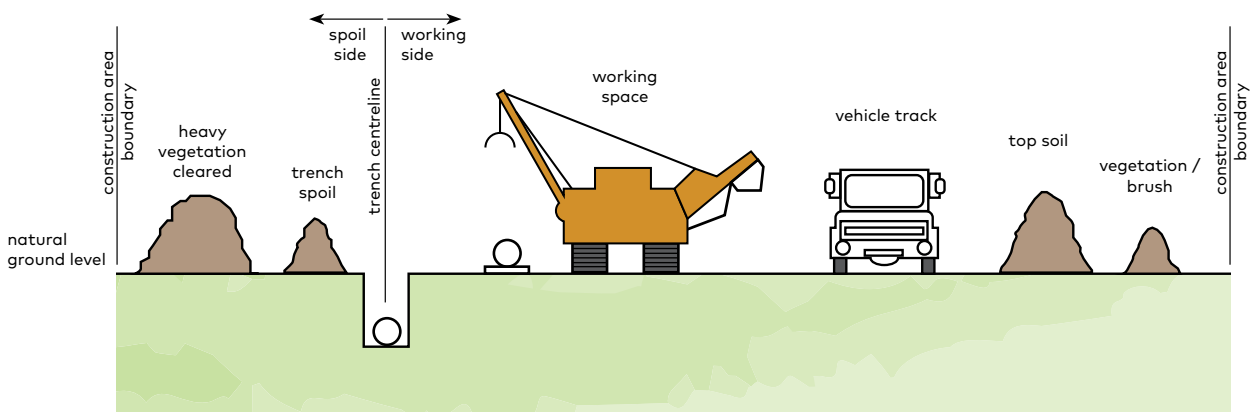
Typical construction right of way (ROW) layout for a pipeline
